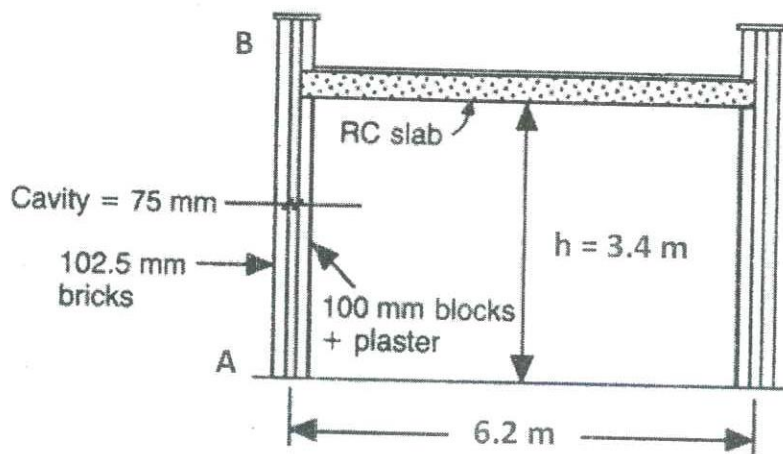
Cross-section of cavity wall AB and the RC roof slab
